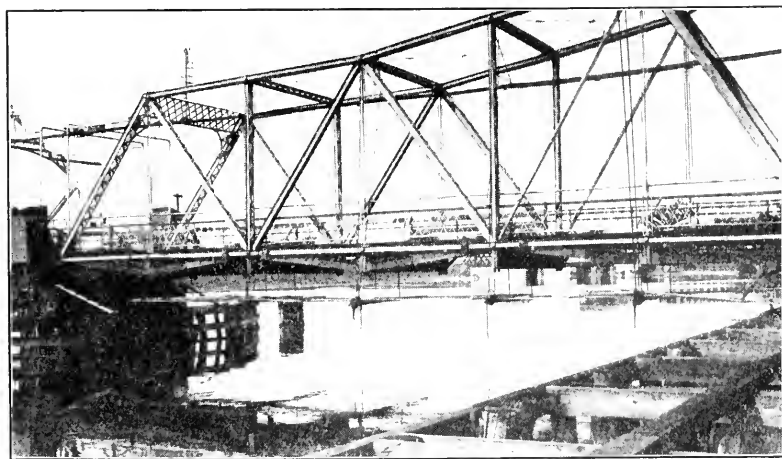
WEST HALF OF SOUTH TRUSS WITH TEMPORARY CHORD IN PLACE.
